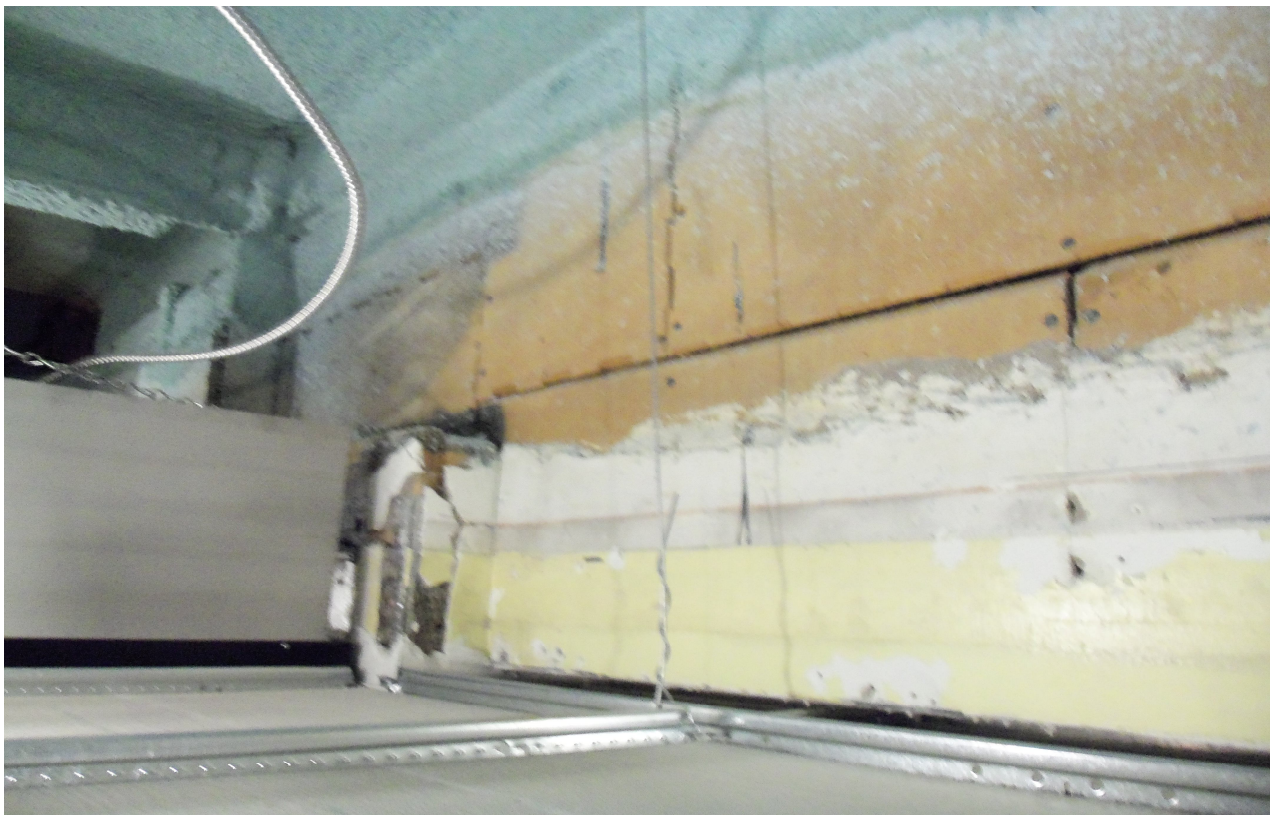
View in Ceiling Space – Fibreboard behind Plaster. Sprayed Fibreboard above.
